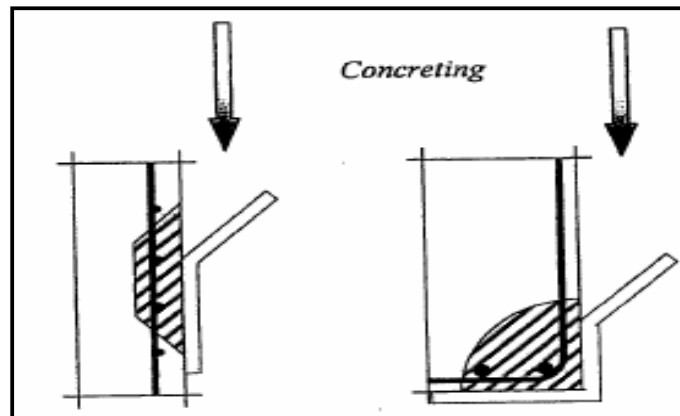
Patch repairs to damaged concrete surfaces
